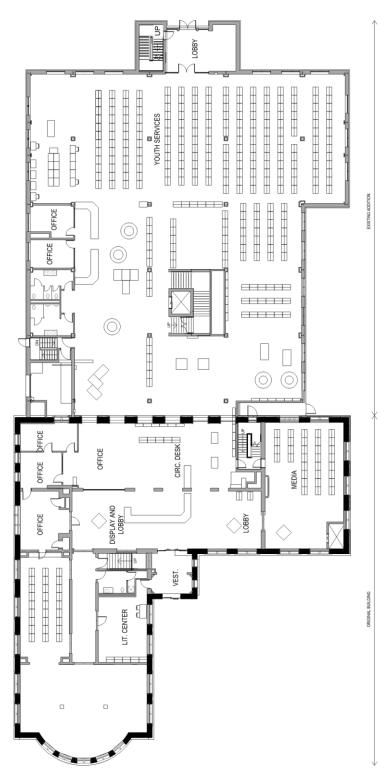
First floor sketch floor plan, not to scale. (JLK Architects 2025)
